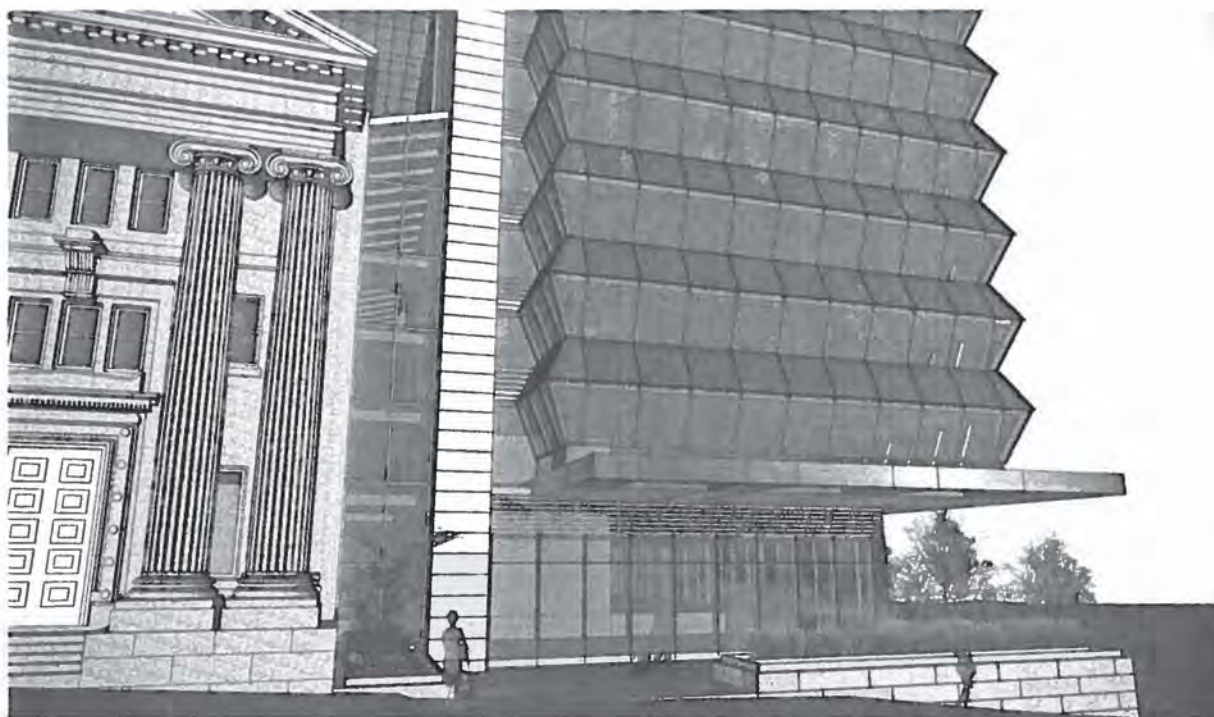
George Street facade of the conserved Bank of Commerce Building, atrium and hotel plaza.
